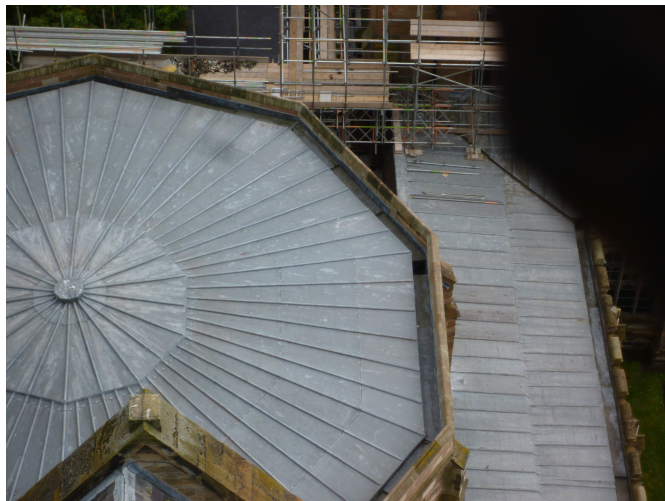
Looking down from the topmost roof to the Chapter House roof
